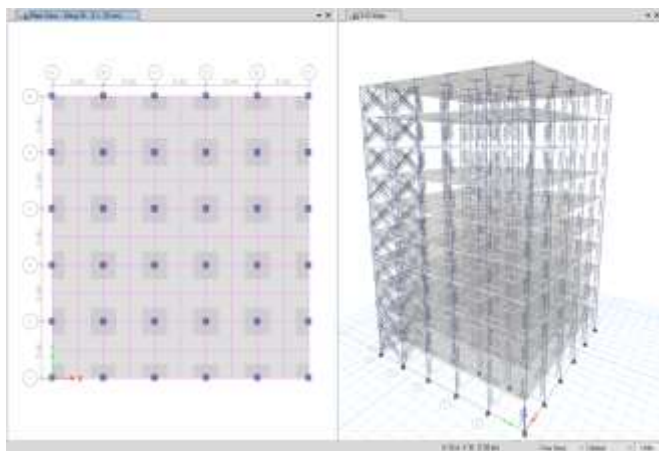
MODEL-C4 TORSIONAL IRREGULARITY-FLAT SLAB BUILDING WITH BRACINGS
